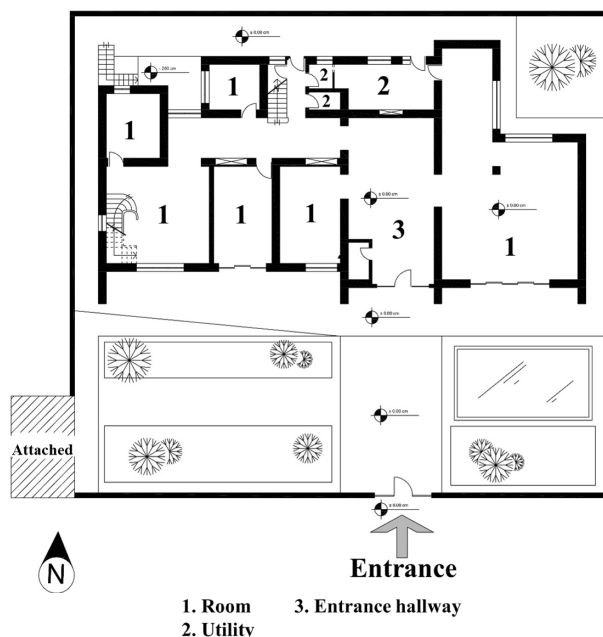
Ground floor plan (1/250) of the House No. 5. Source: Authors.
